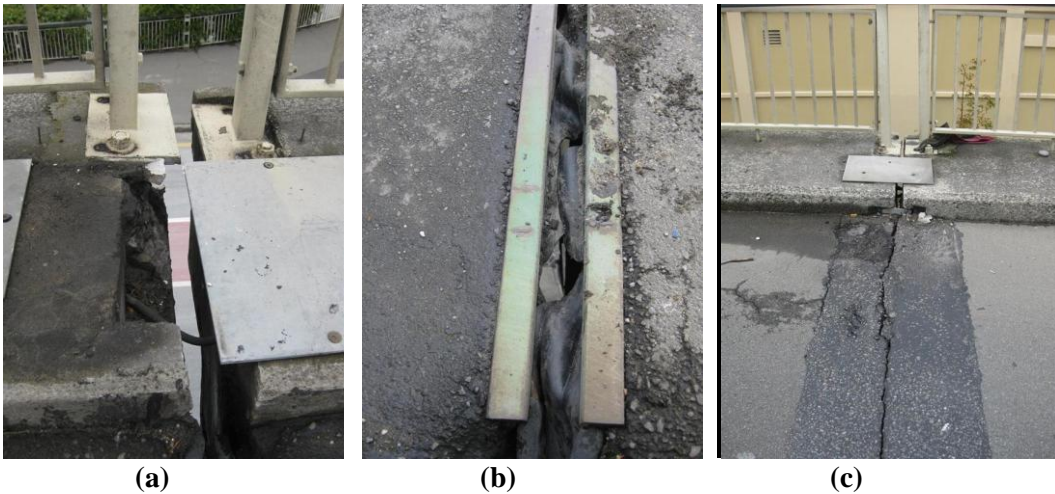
(a) 10 mm drop in deck height of centre section of bridge at east expansion joint due to failure of pier beneath. (b) Opening of the expansion joint of the deck (c) Crack of the deck in correspondence to the expansion joint
